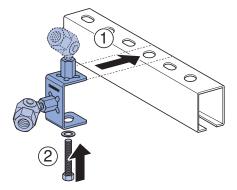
Attaching the Geberit Pluvia suspension element in the case of pipes d250-315
